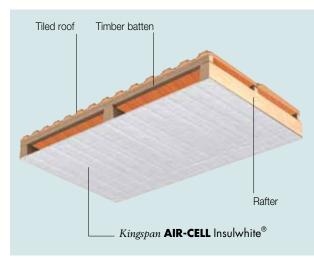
Kingspan* AIR-CELL Insulwhite<sup>®</sup> in a pitched tiled roof retrofit installation (attic conversion)
